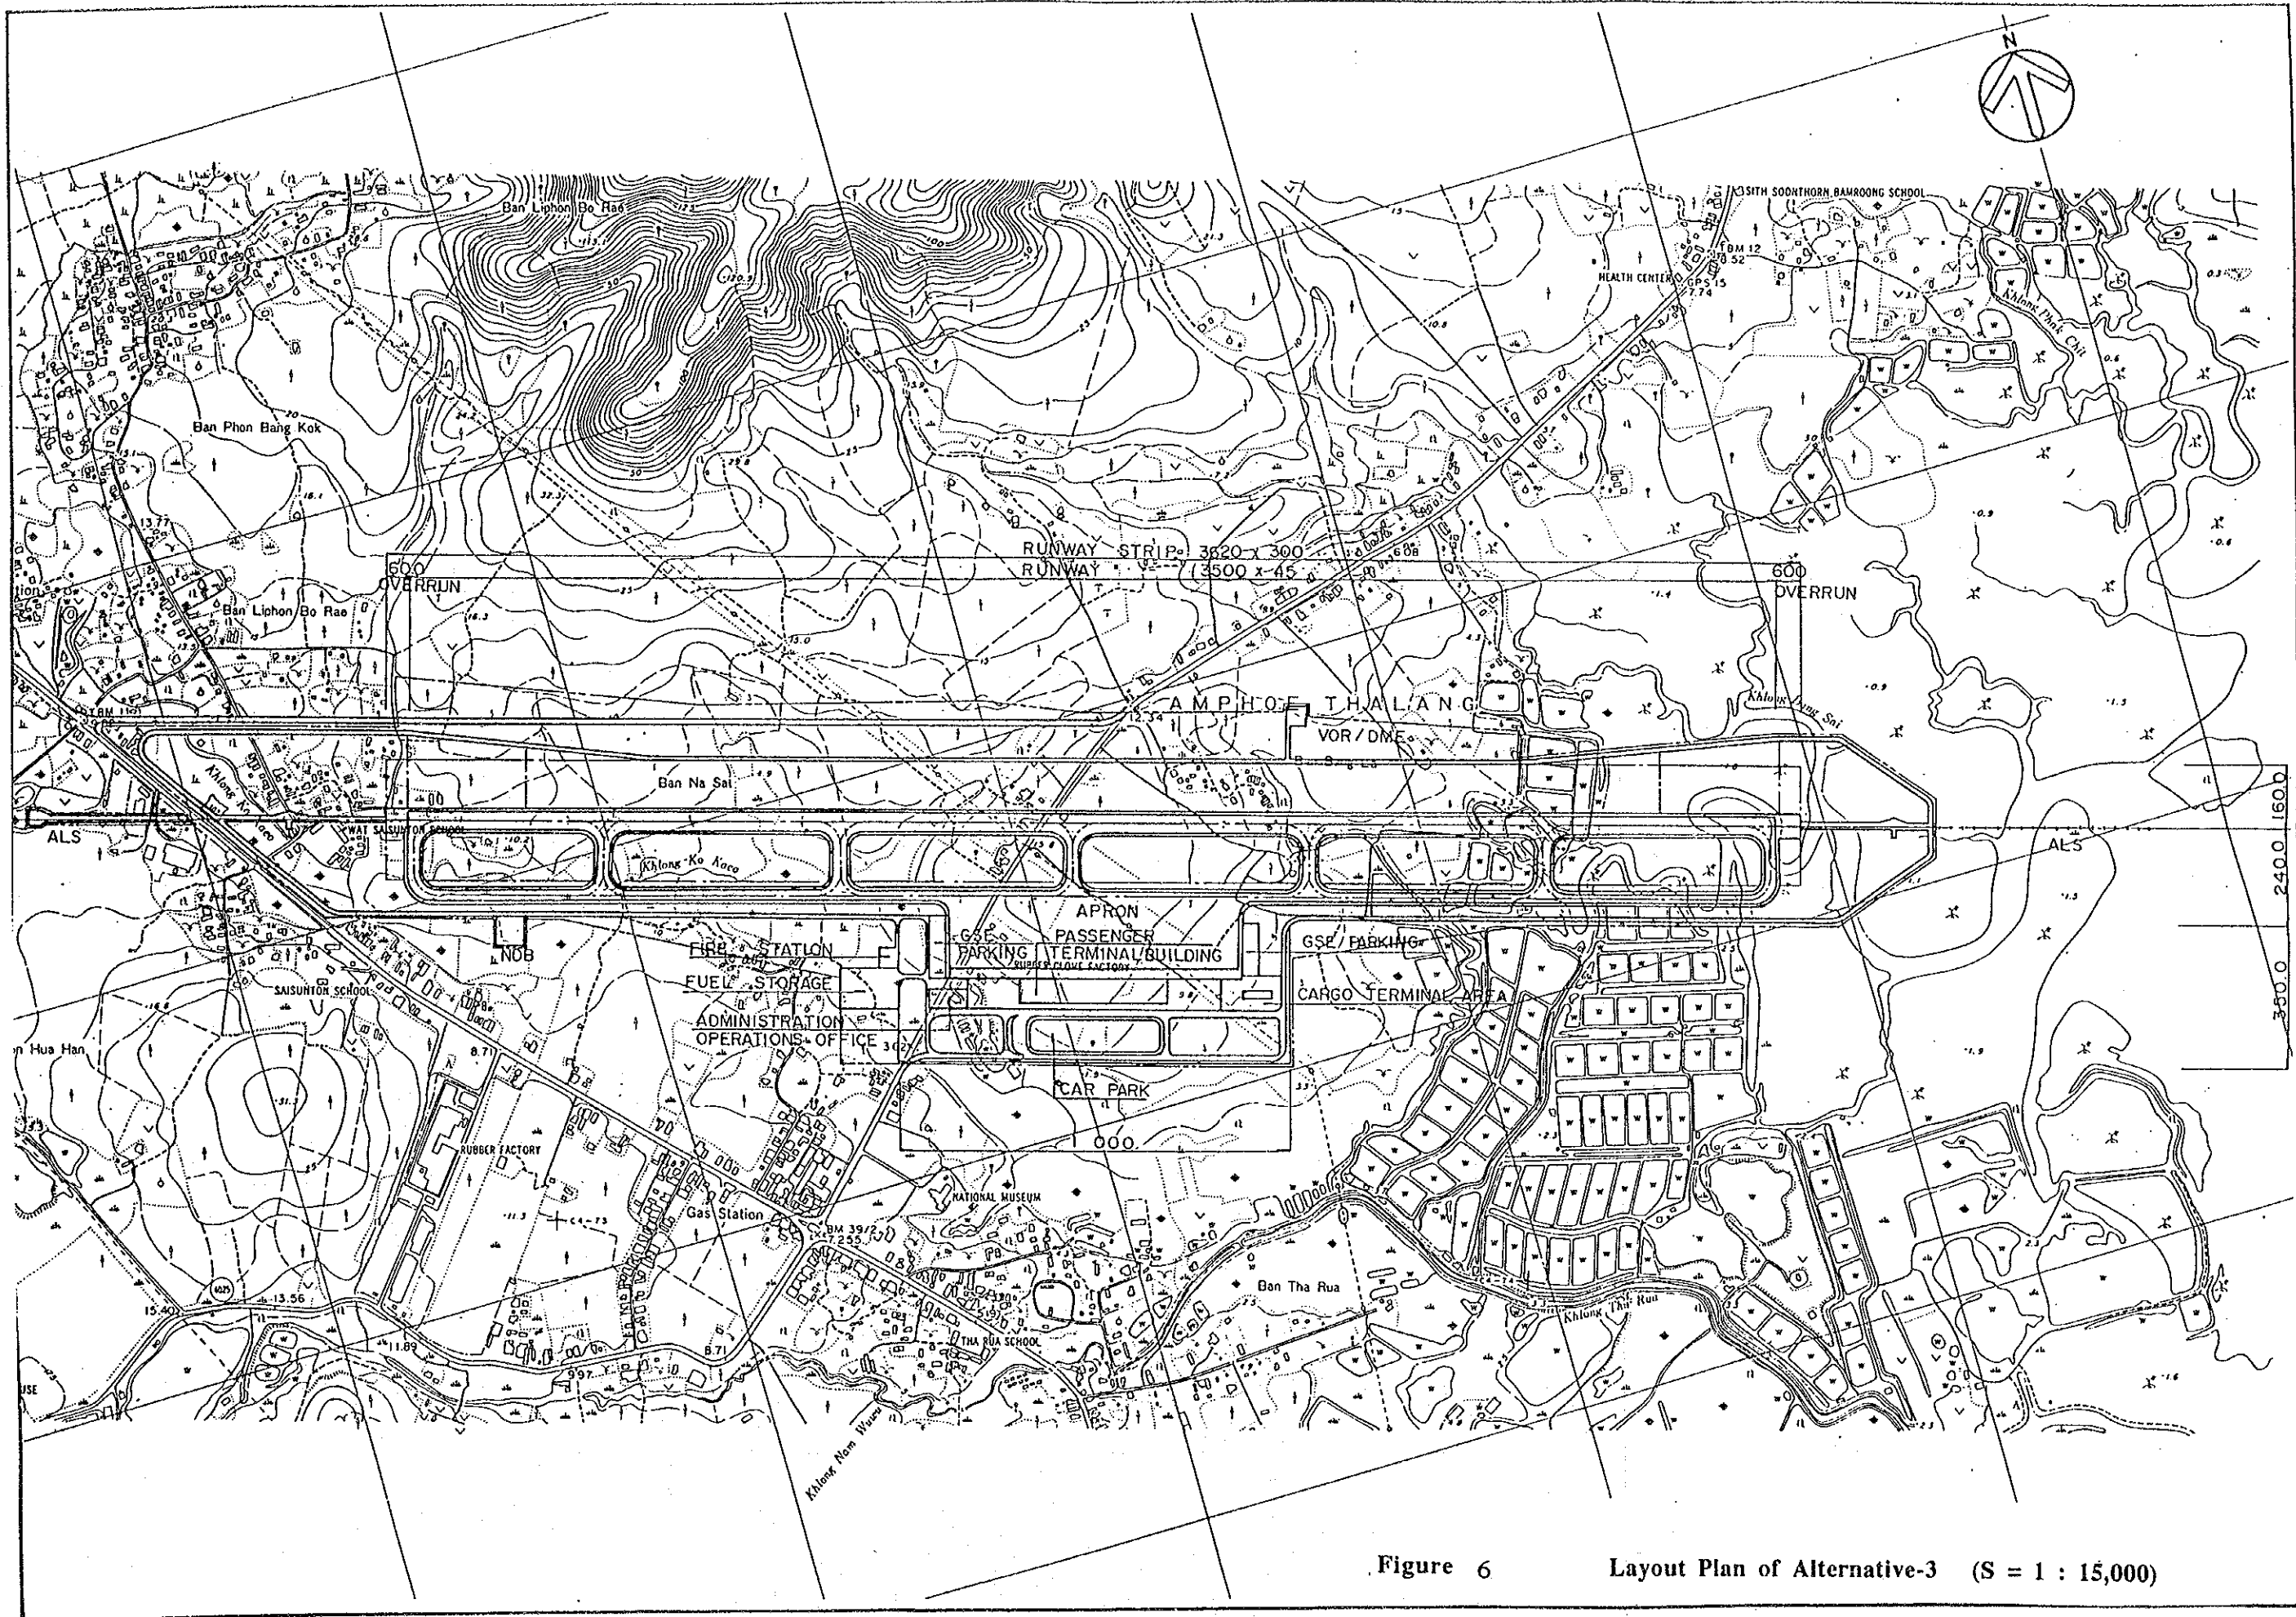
Layout Plan of Alternative-3 (S = 1 : 15,000)
